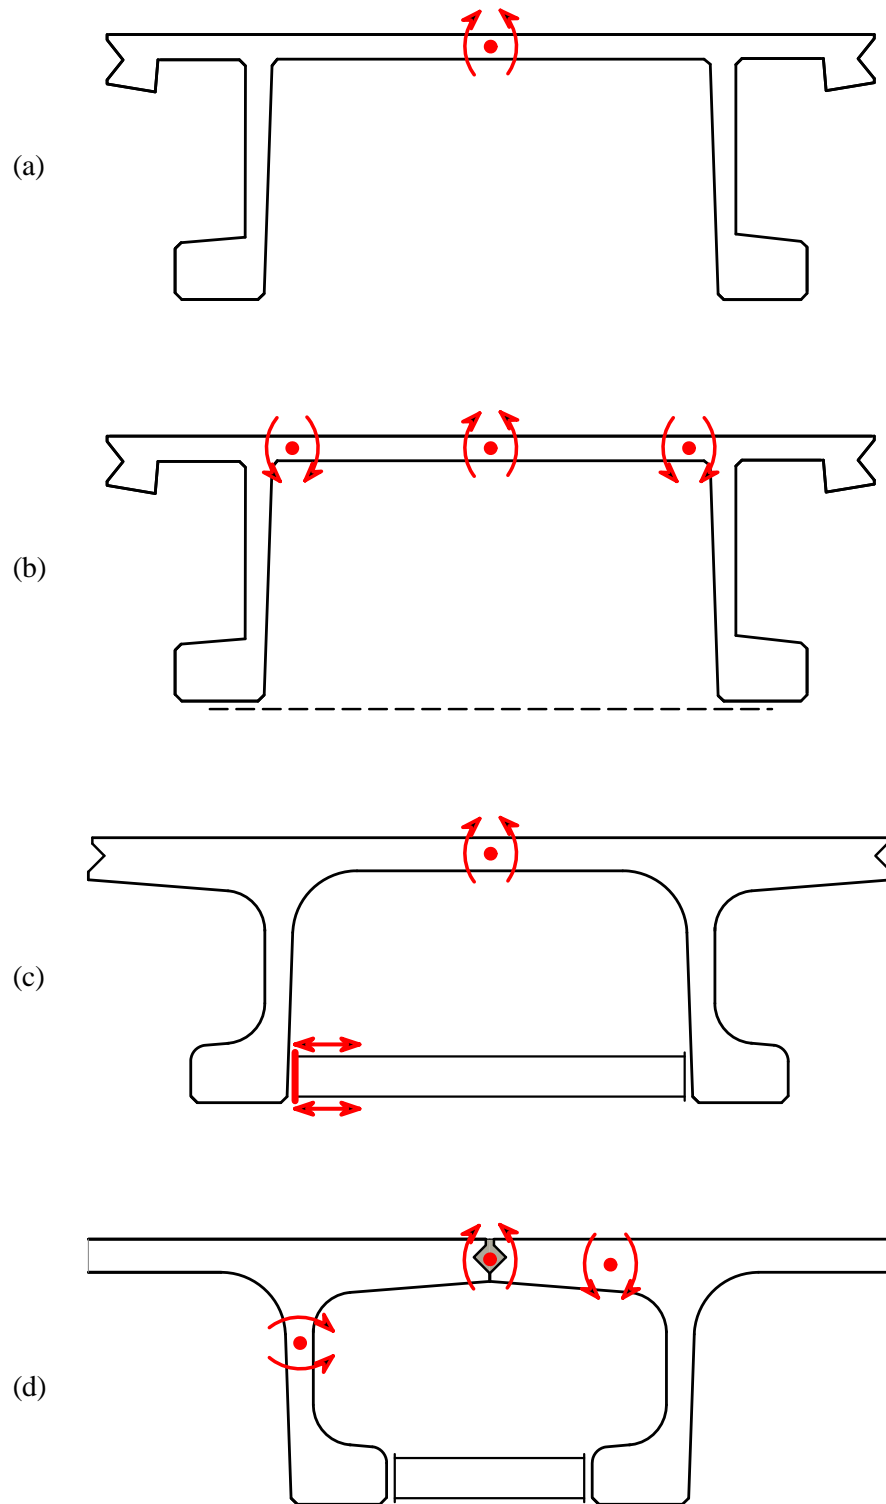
Illustration. Conceptual failure mechanisms observed in (a) Test P4-24T, (b) Test P4-24D, (c) Test T2D, and (d) Test T2J.
